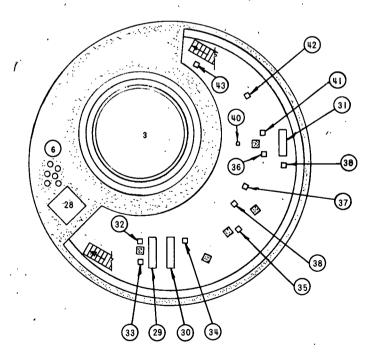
Arrangement of Equipment on Operating Floor and Balcony of Reactor Plant
